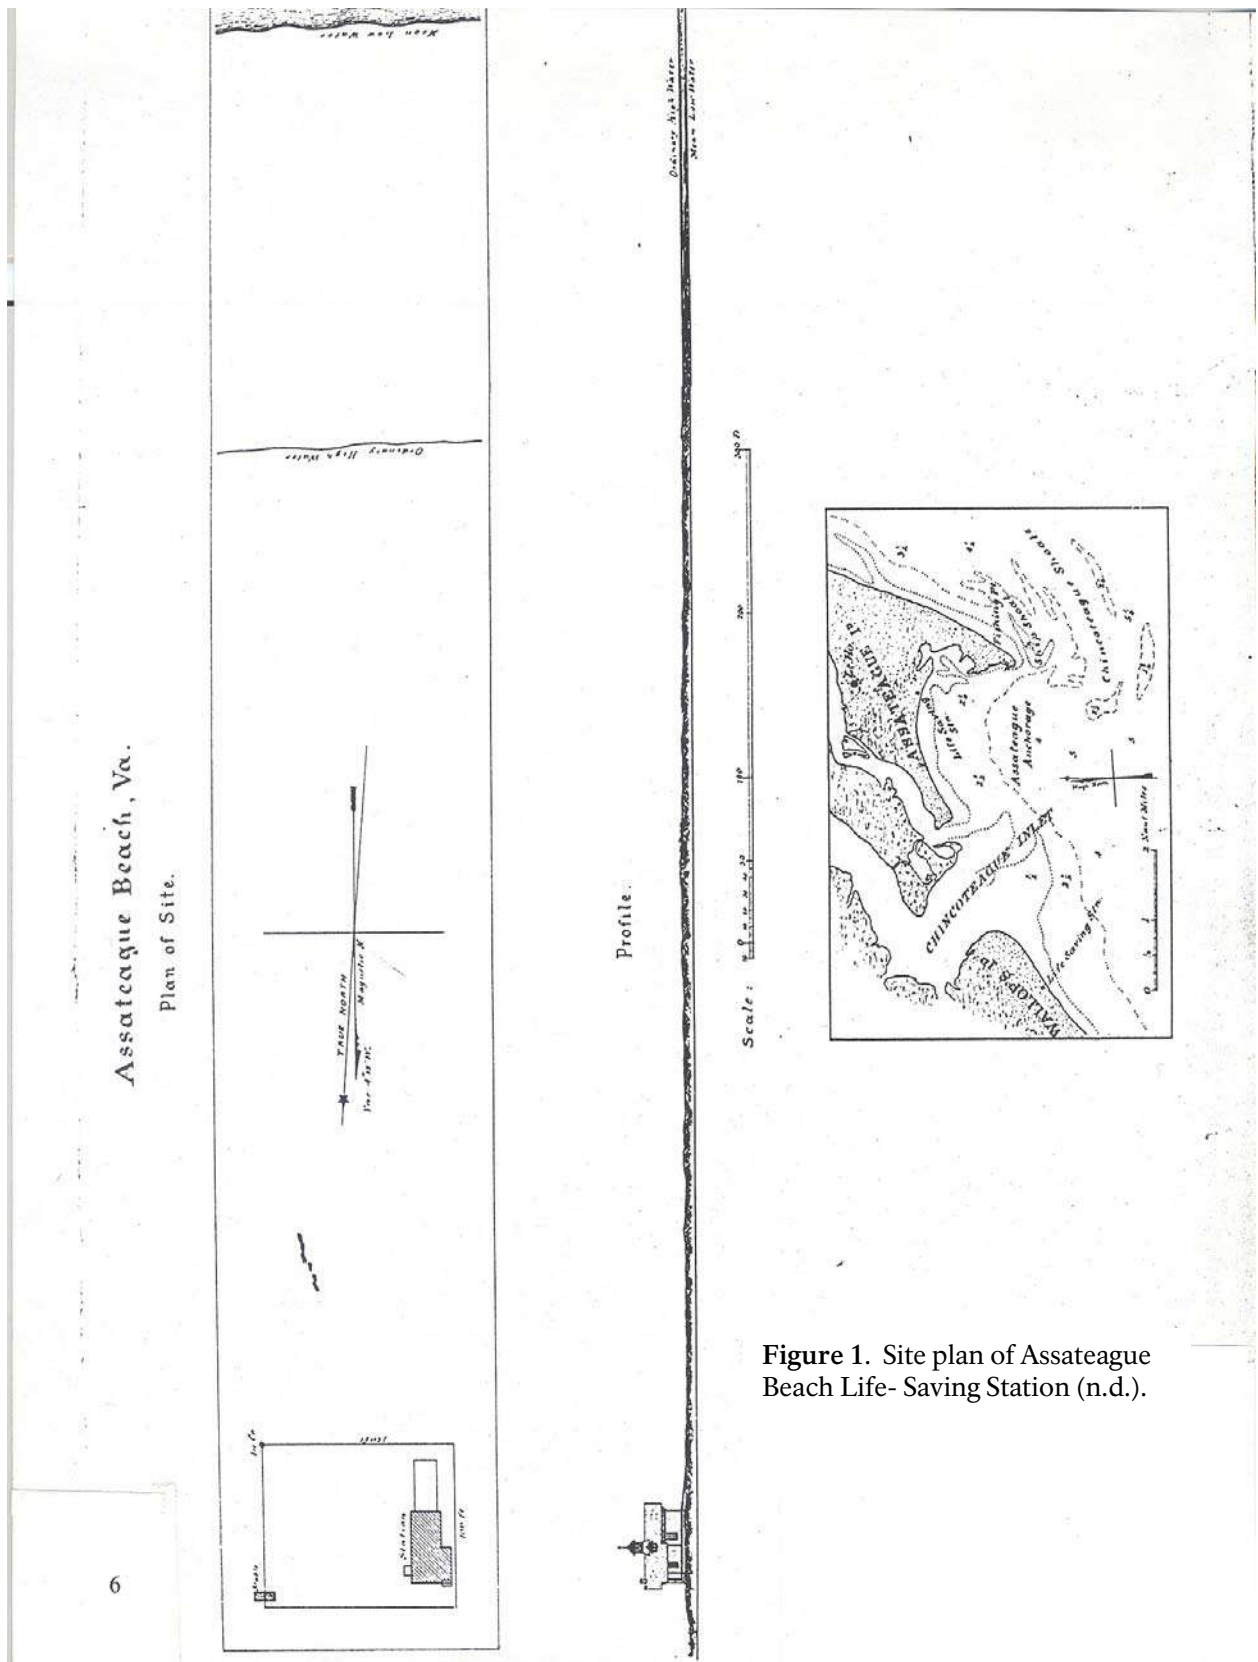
Site plan of Assateague Beach Life- Saving Station (n.d.).
